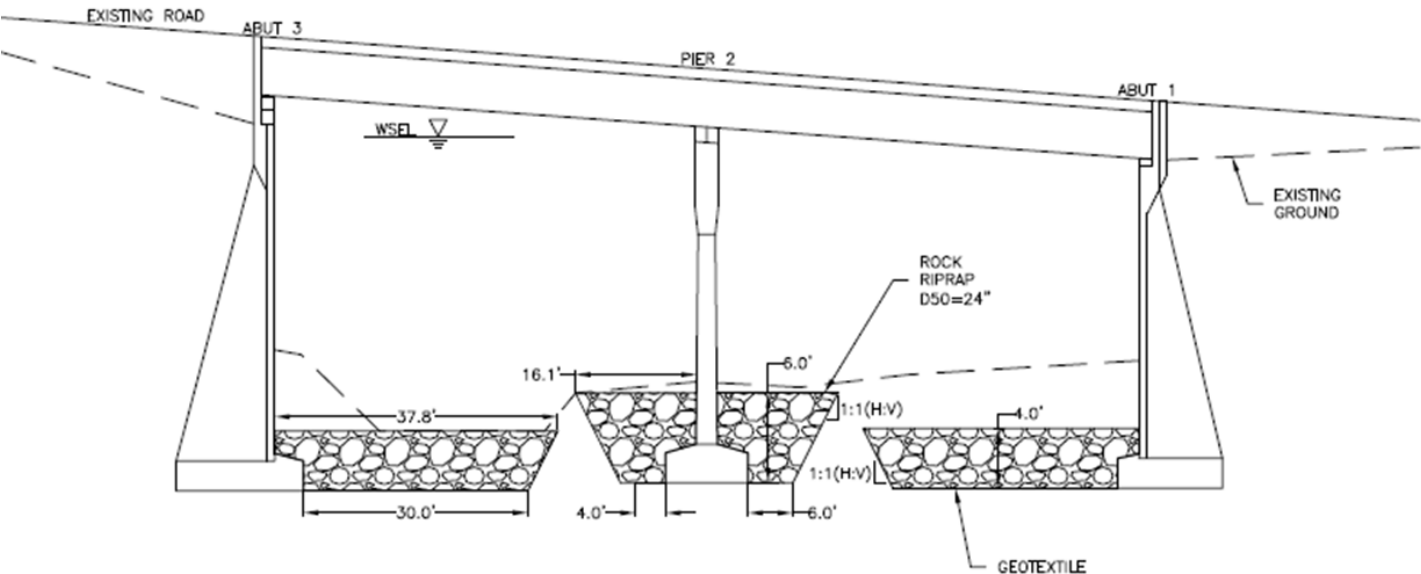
Cross-sectional view of Bridge C-17-F with recommended hydraulic scour countermeasures
